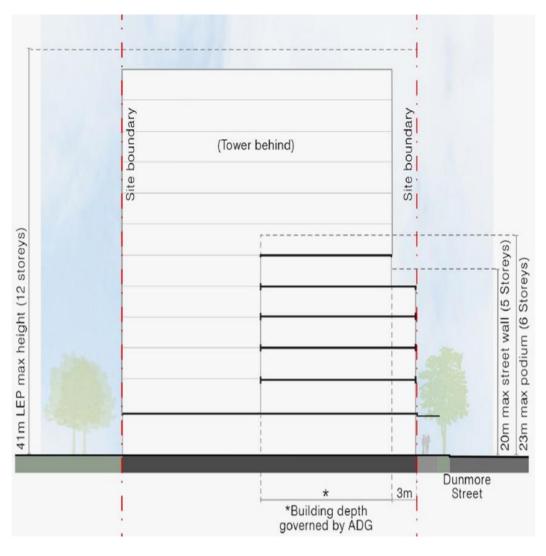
Amalgamated Site 3 - Typical North-South Section
